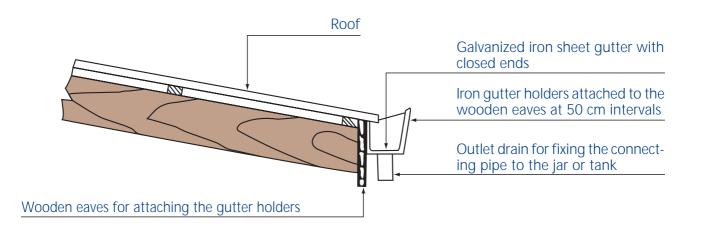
Fix the "U" shape galvanized iron sheet gutter to wooden roof structure using the iron gutter holders.
